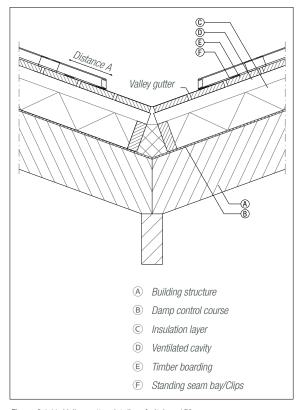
Valley gutter detail roof pitch > 15°
